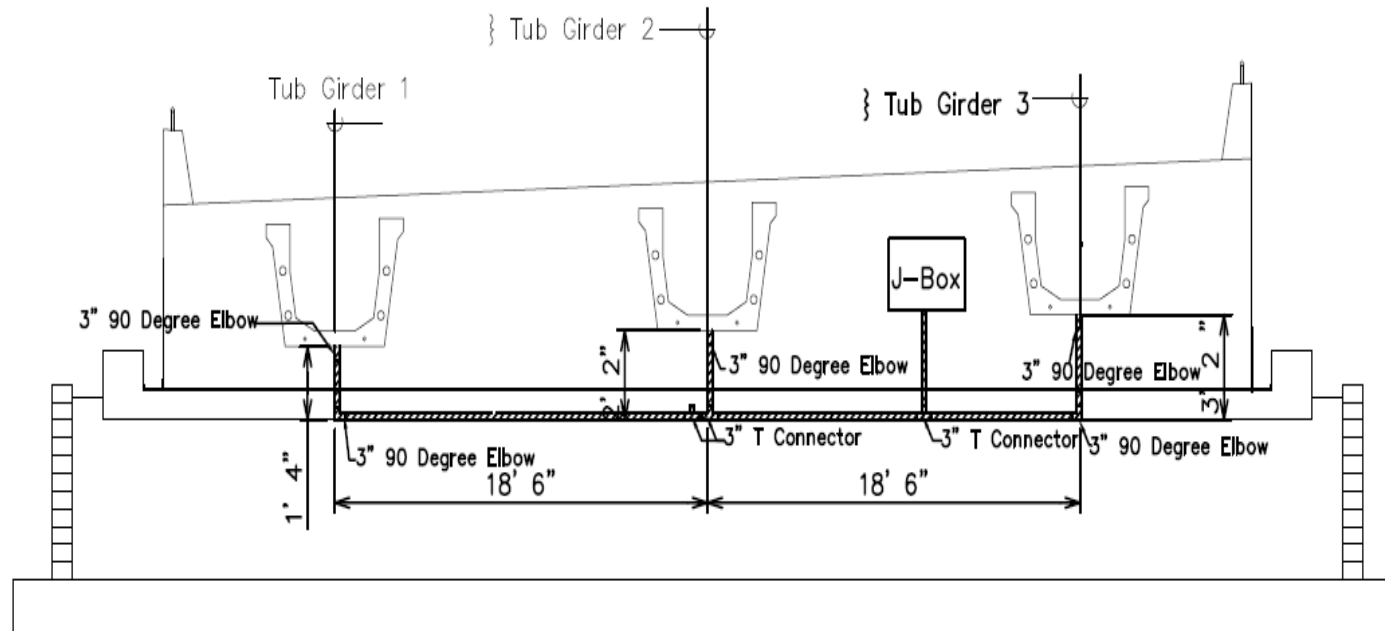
PVC Pipe System Under the Middle Tub Girder
